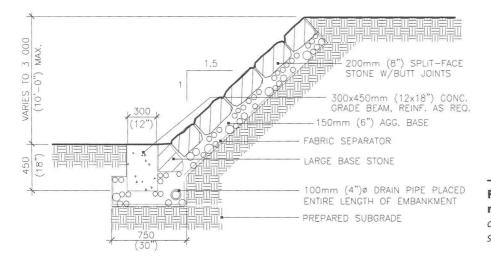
Stone retaining embankment. Stone thickness and weight are determined by soil pressure. Non-porous stone preferred.
